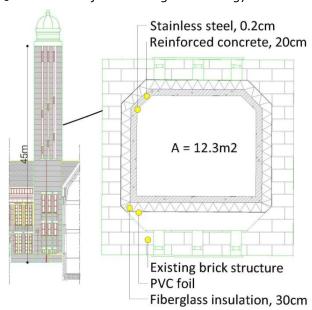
Elevation of the water tower as is today and a typical section showing the necessary interventions to transform it into a storage tank
